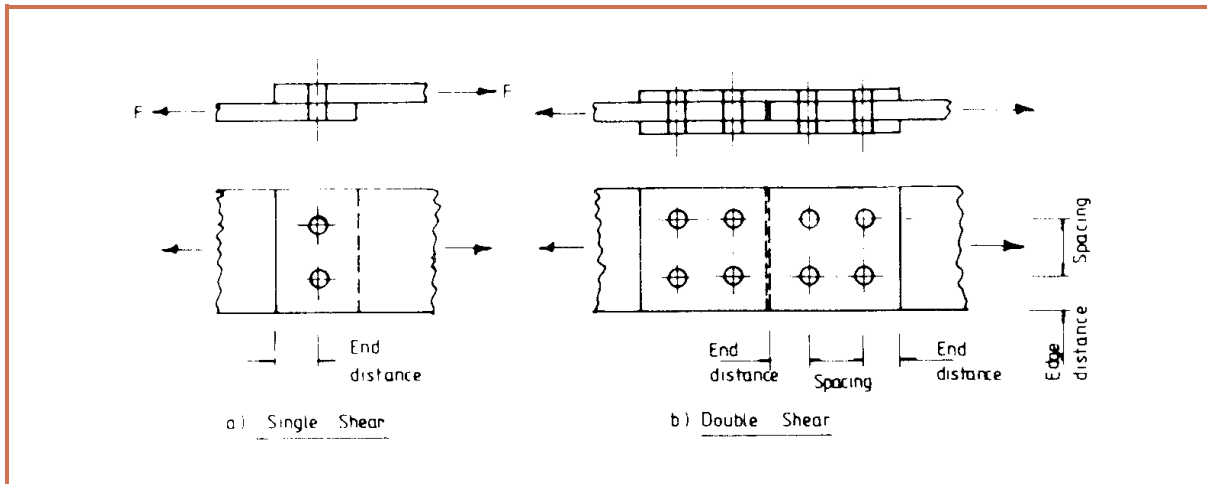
Bolts in single and double shear (extracted from ref. 6)
